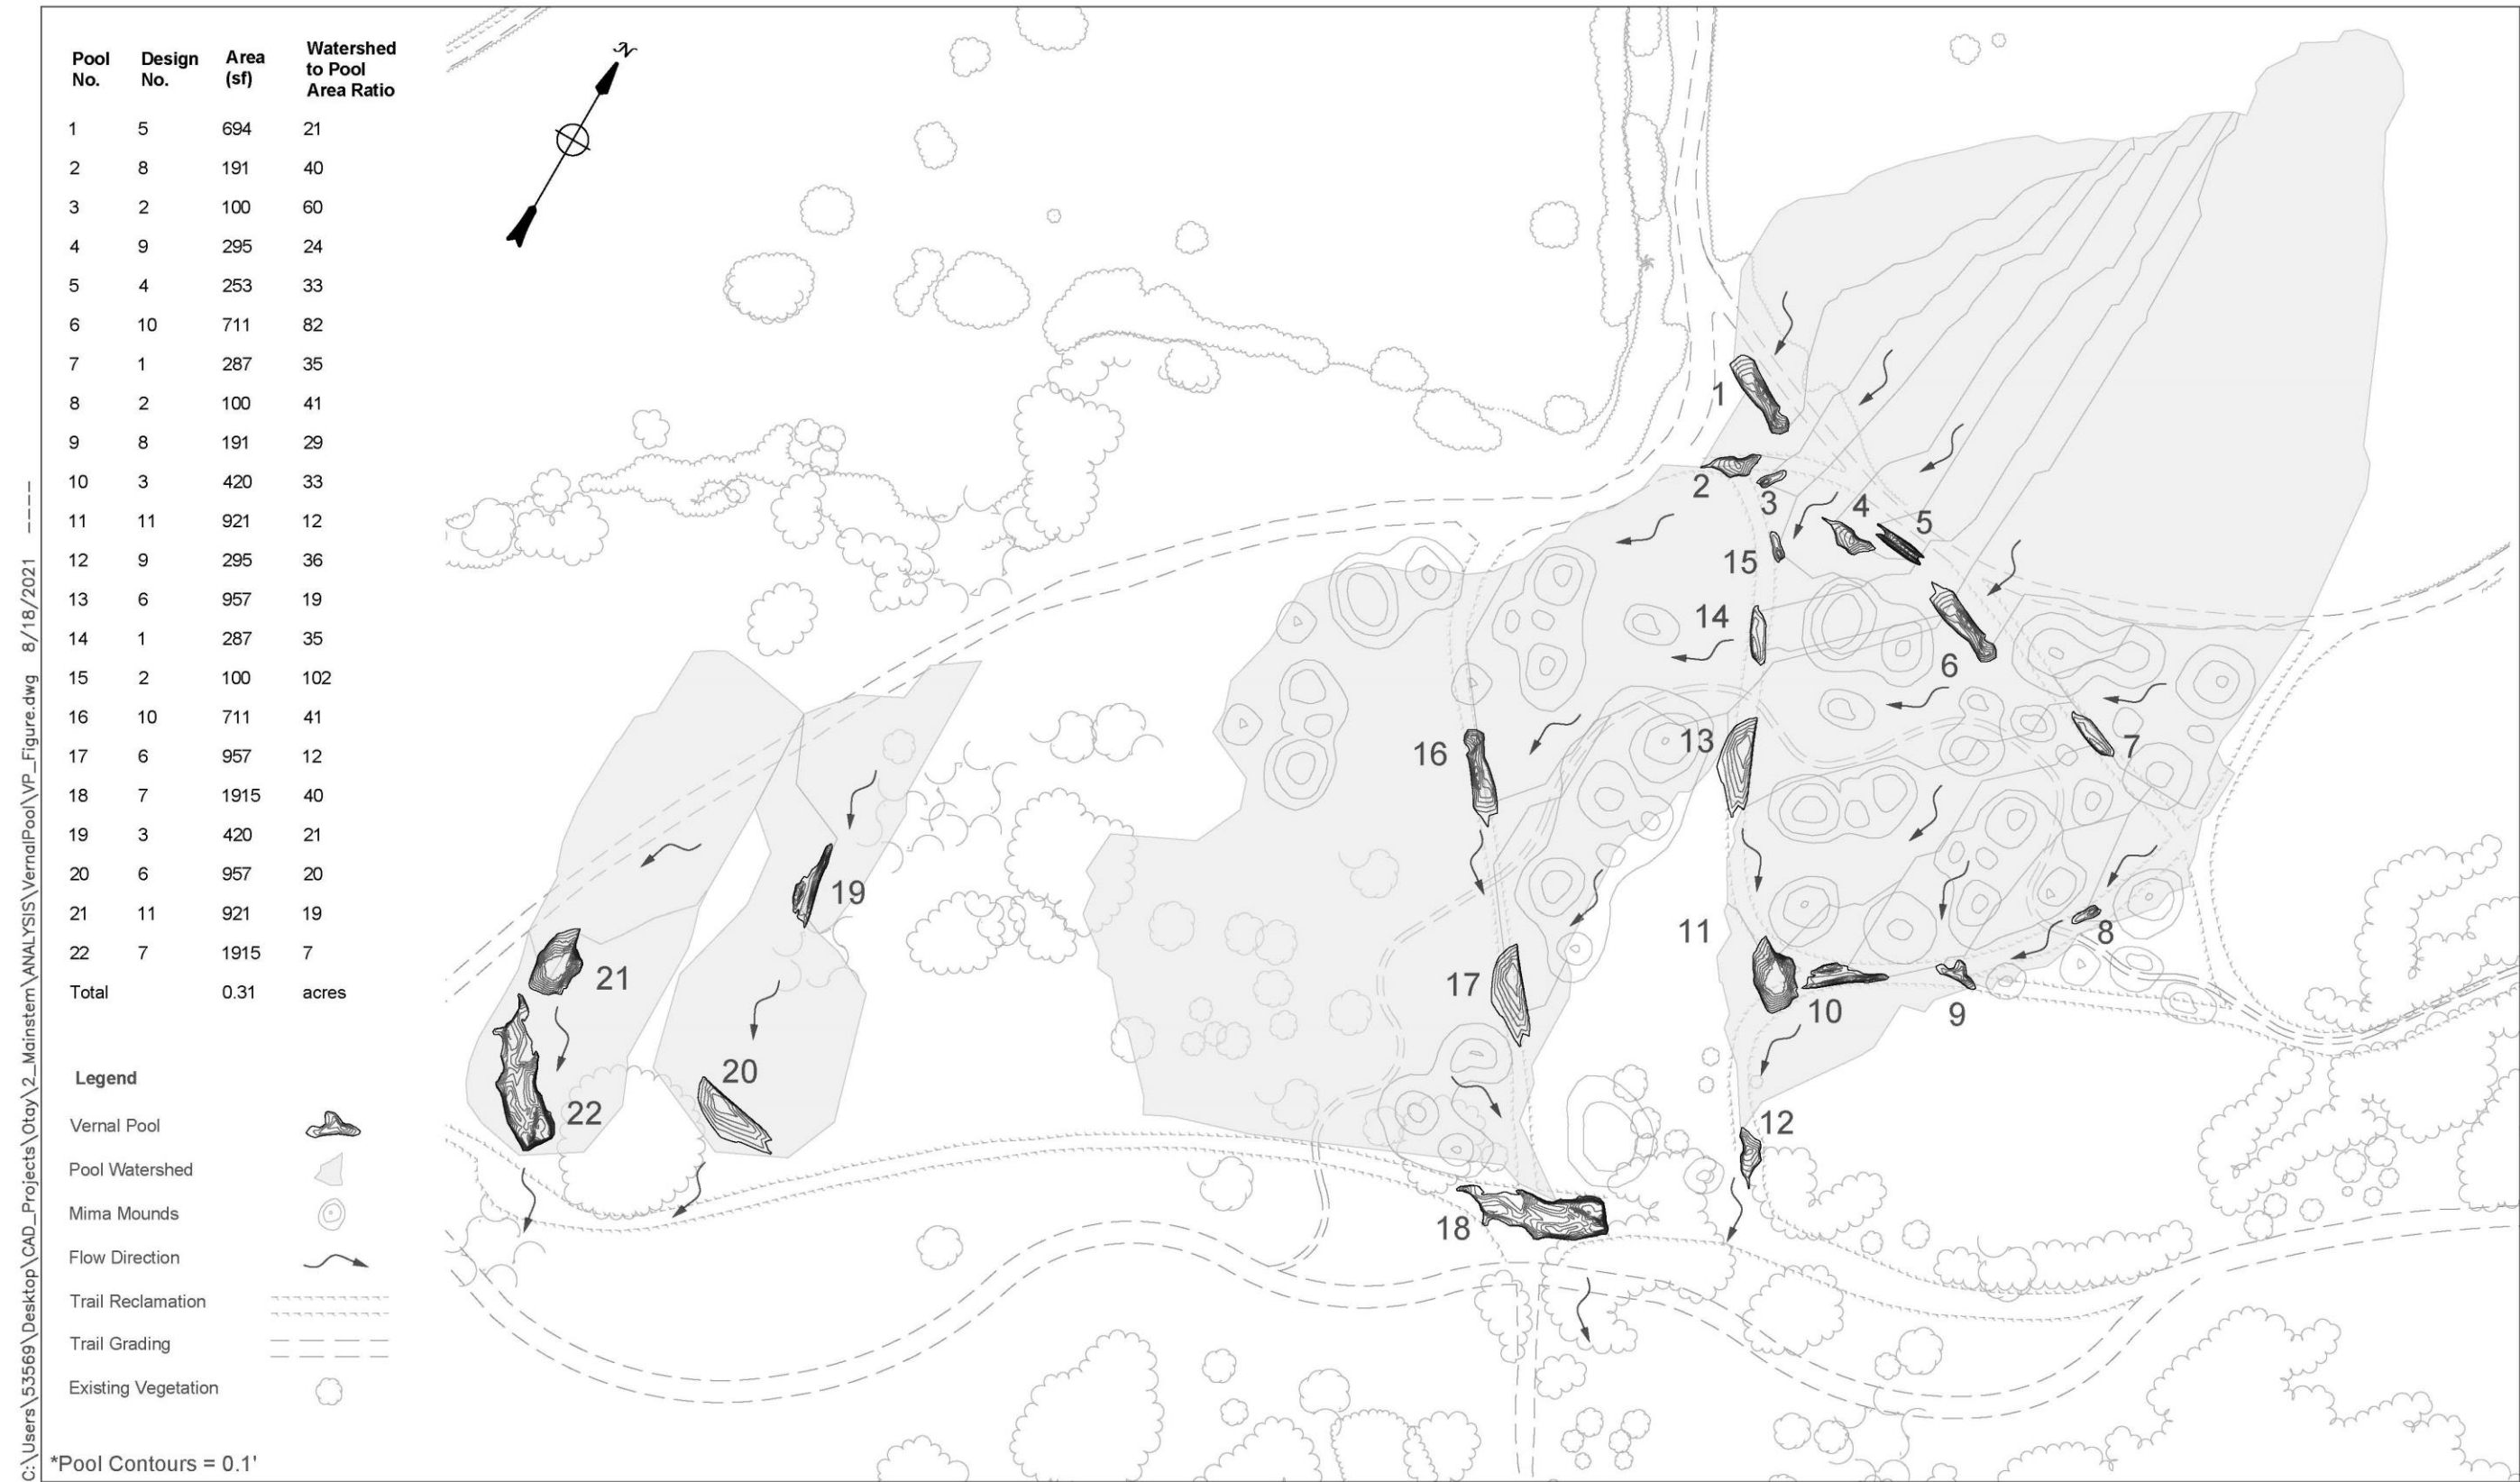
Sheet 1, Vernal Pool Concept Layout
